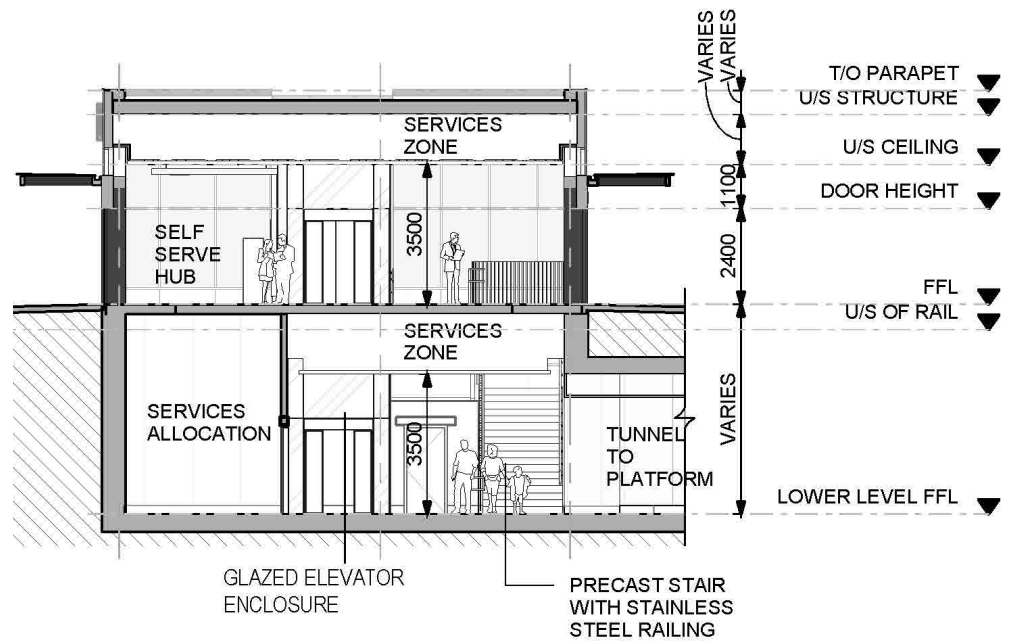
Longitudinal Section of Platform Access Module (Tunnel configuration)
